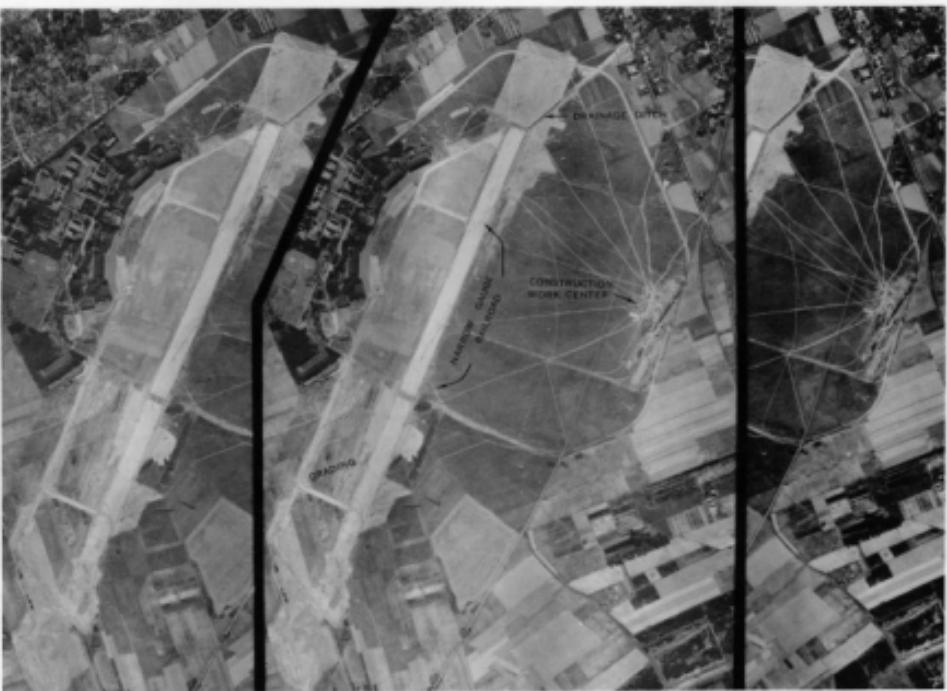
Concrete runway under construction at a World War II German airfield in the Sovzone, Germany. Scale 1:21,000
